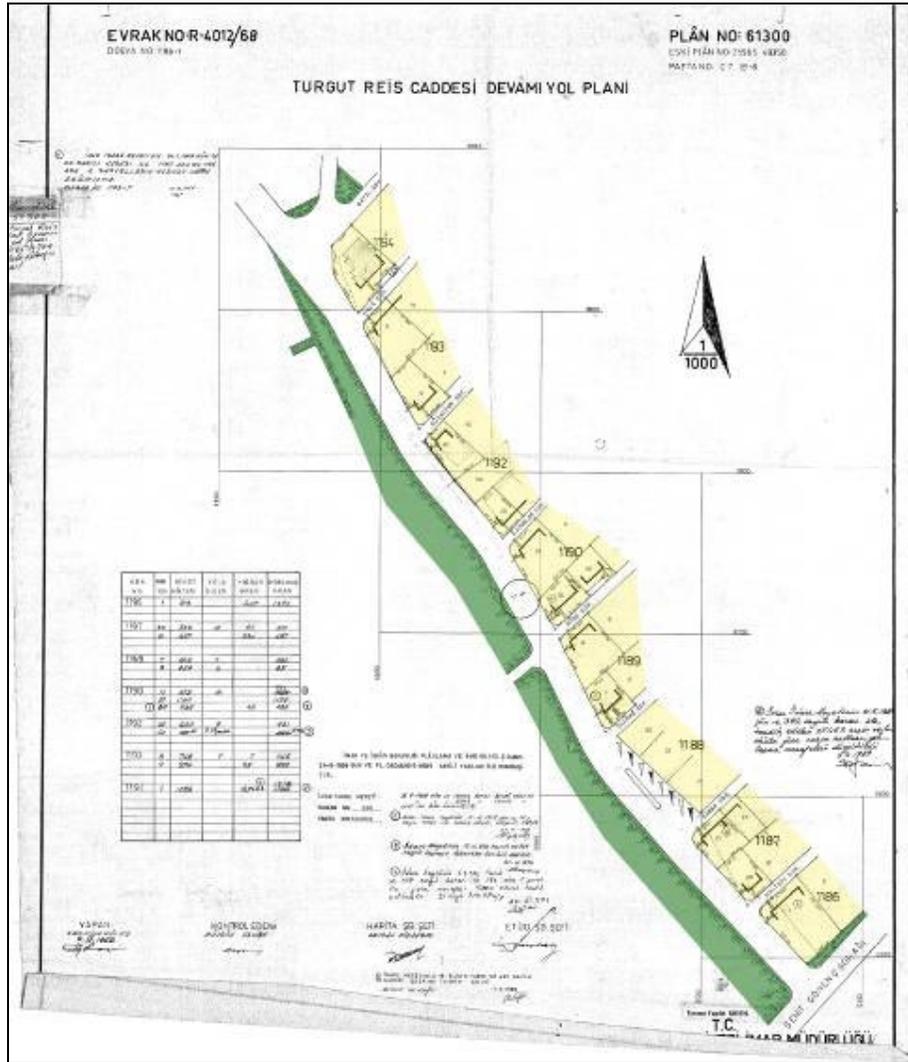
Turgut Reis Street Extension Plan (Plan no. 61300, 2.9.1968. Plan Archive of the Greater Ankara Municipality)
